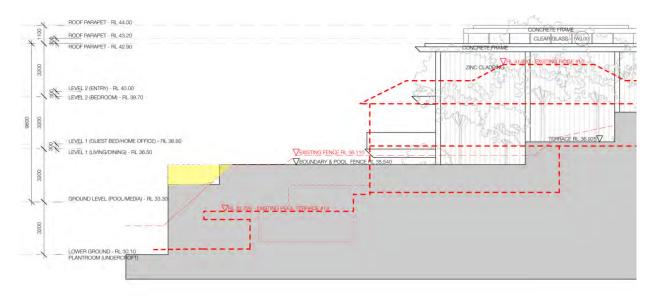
Elevation plan showing the proposed retaining wall along the western boundary
